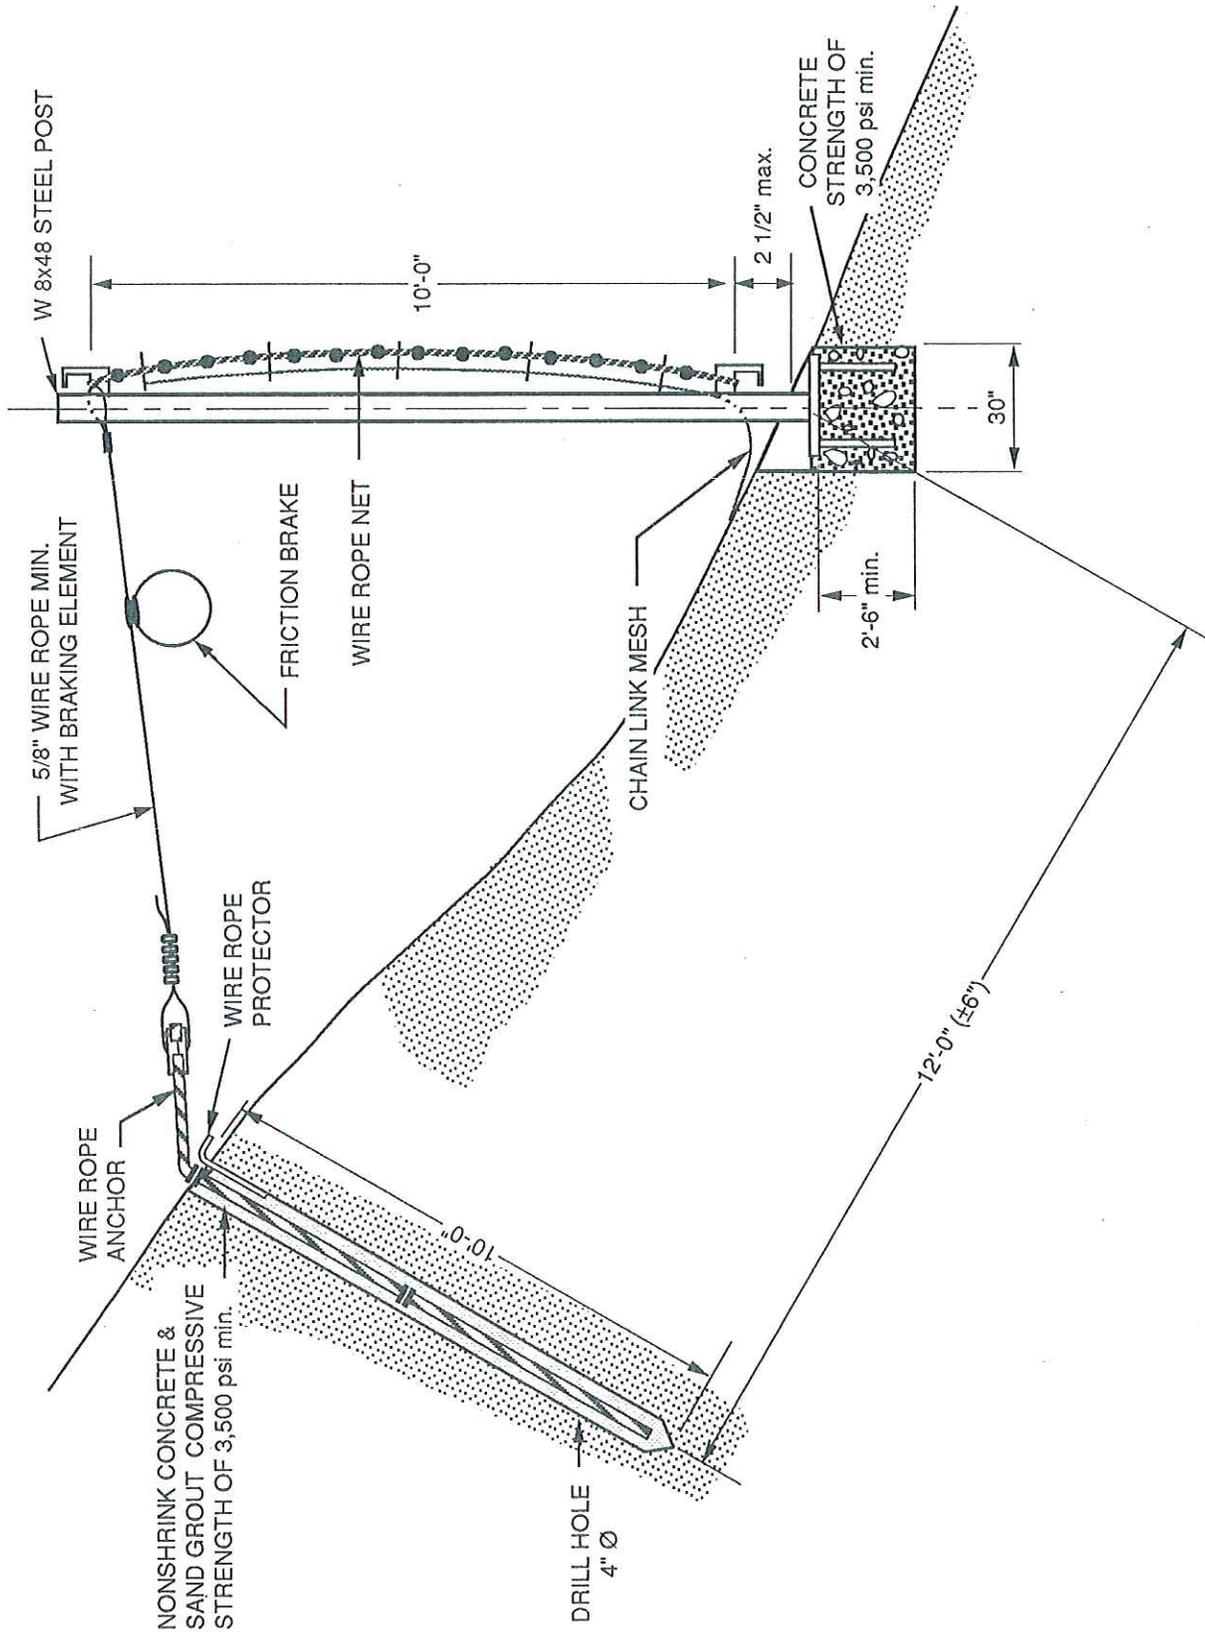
SIDE VIEW OF A BRUGG BASEPLATE POST FOUNDATION WITH UPSLOPE ANCHOR SUPPORT
